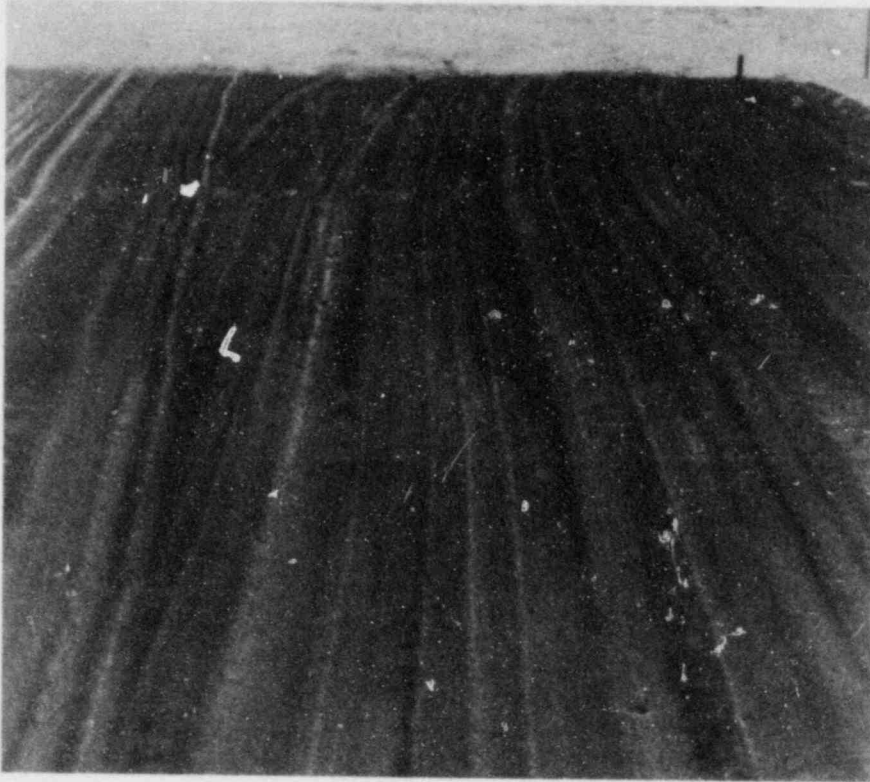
Test Plot at the Wyoming Test Site After Application of Retain Asphalt Emulsion Stabilizer
